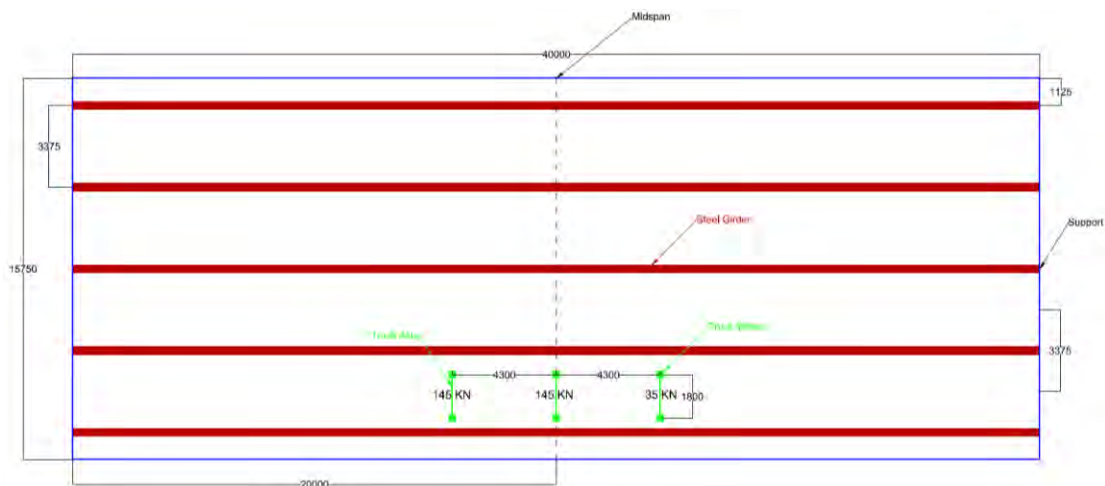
Simply-supported 40m span bridge with 5 parallel girder
